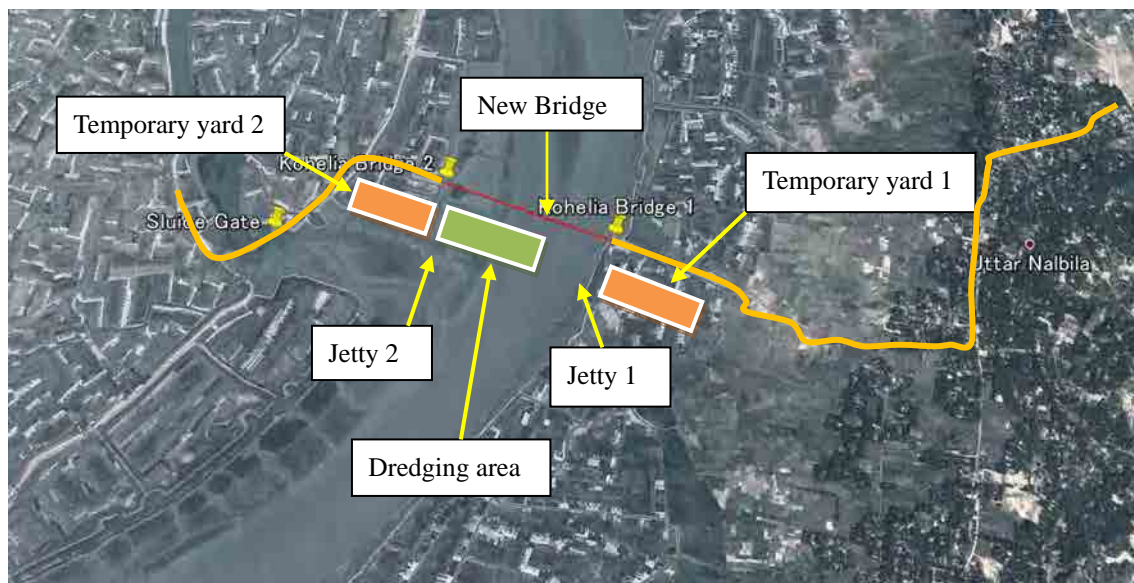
Location of Temporary Yard, Jetty and Dredging Area
